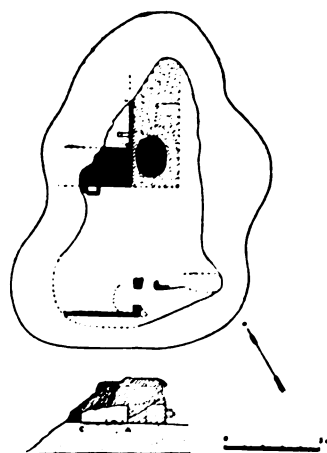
Plan and section of Watch-station A 2 (Tsaghan-tsonch). Intersecting lines mark the base of a tower; hatching, walls of different kinds. Brick masonry. C—A is the white-washed wall of Locality I; the house remains are labelled Locality II.
